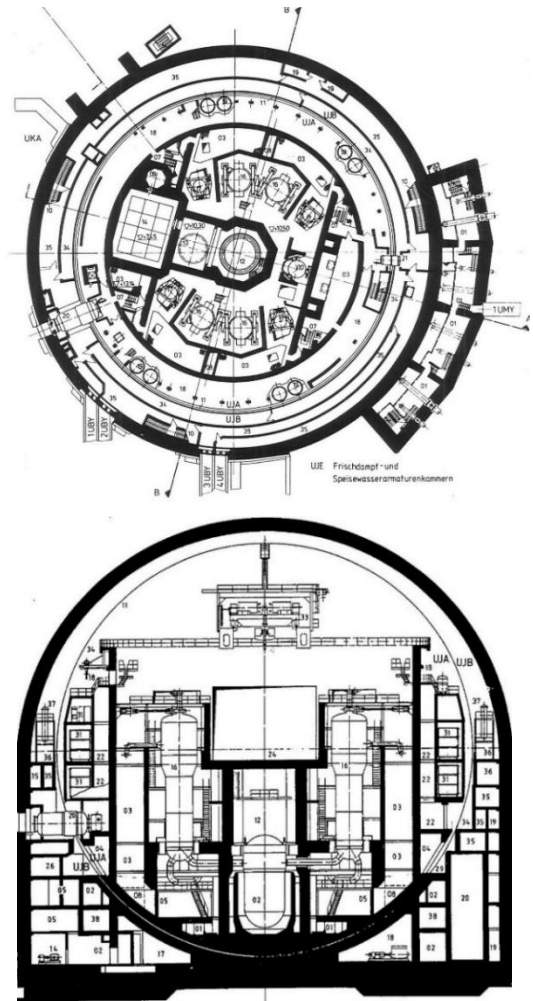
+12 m elevation cut (up) and sectional cut (down) from the public layouts of the PWR-KWU containment. Ref: [4]
